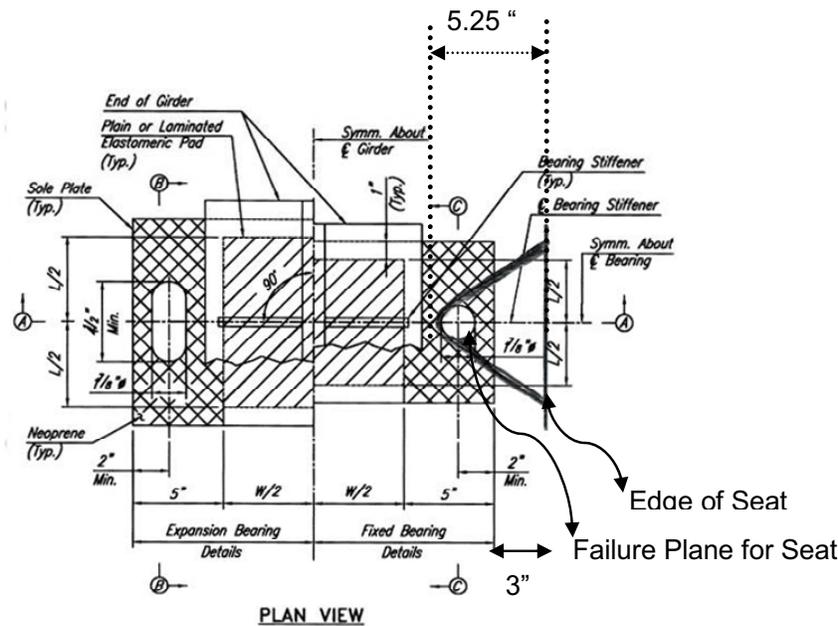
Anchor Bolt Shear Failure Plane (Connection Details Not Applicable, See Figure 5.17)
